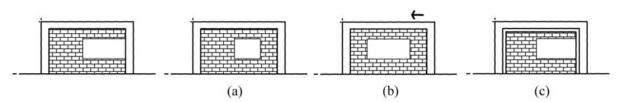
Effective measures to prevent short column: (a) Changing the size of opening, (b) Changing the location of opening, (c) separating walls from column
